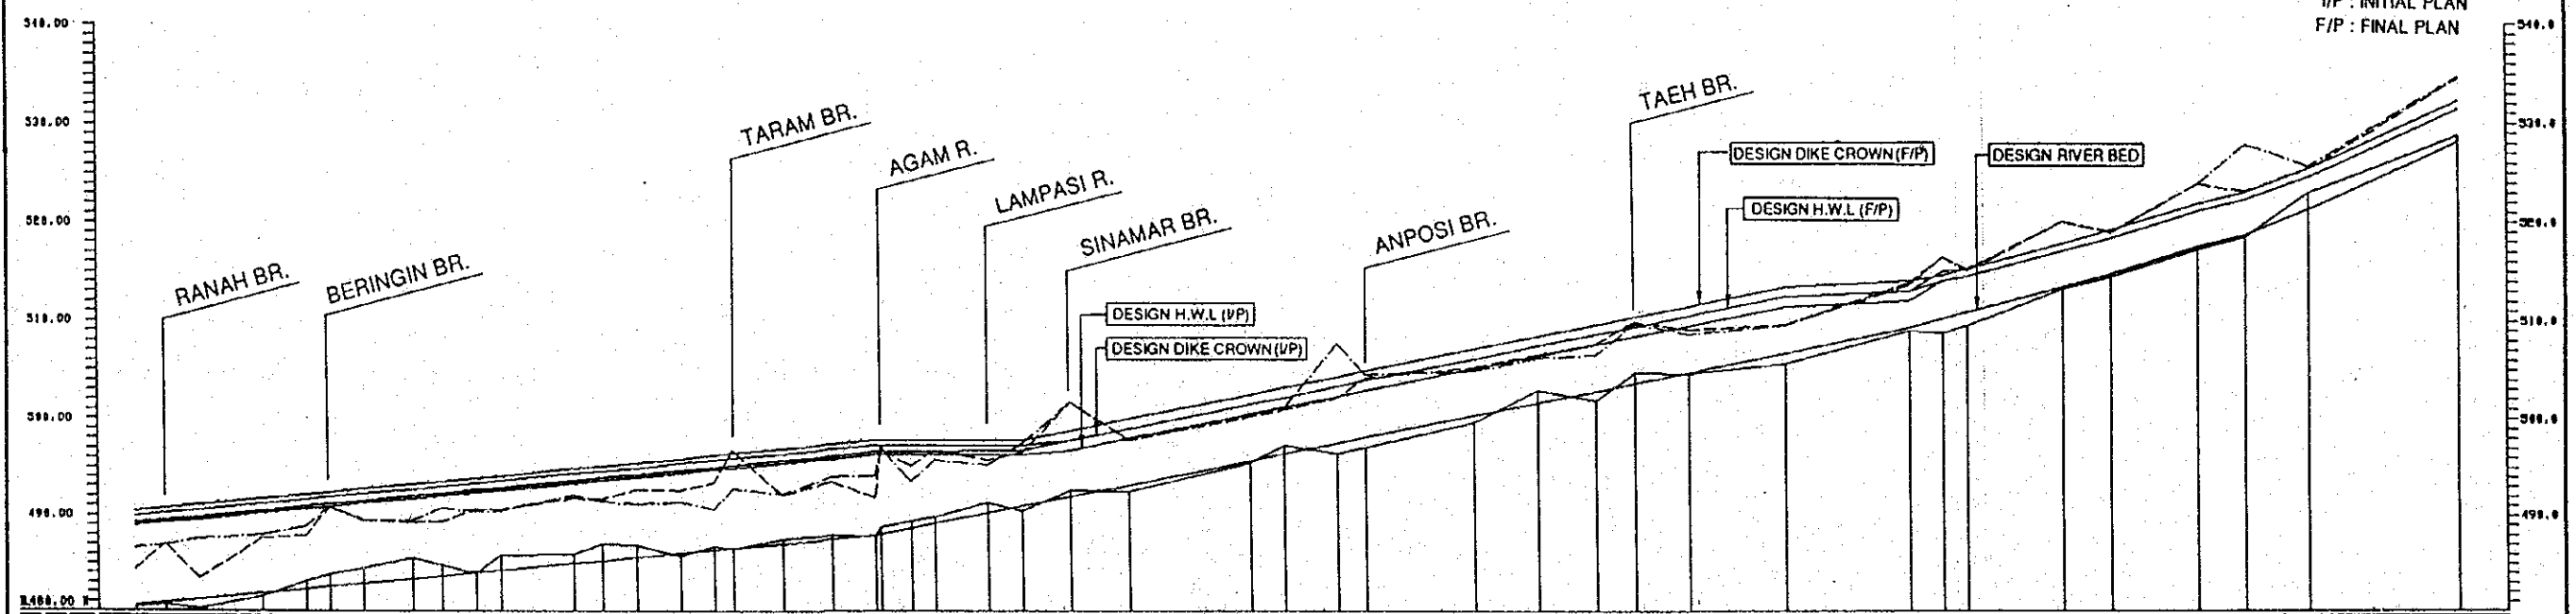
PROPOSED PLAN OF RIVER IMPROVEMENT FOR UPPER INDRAGIRI RIVERS (4/4)
